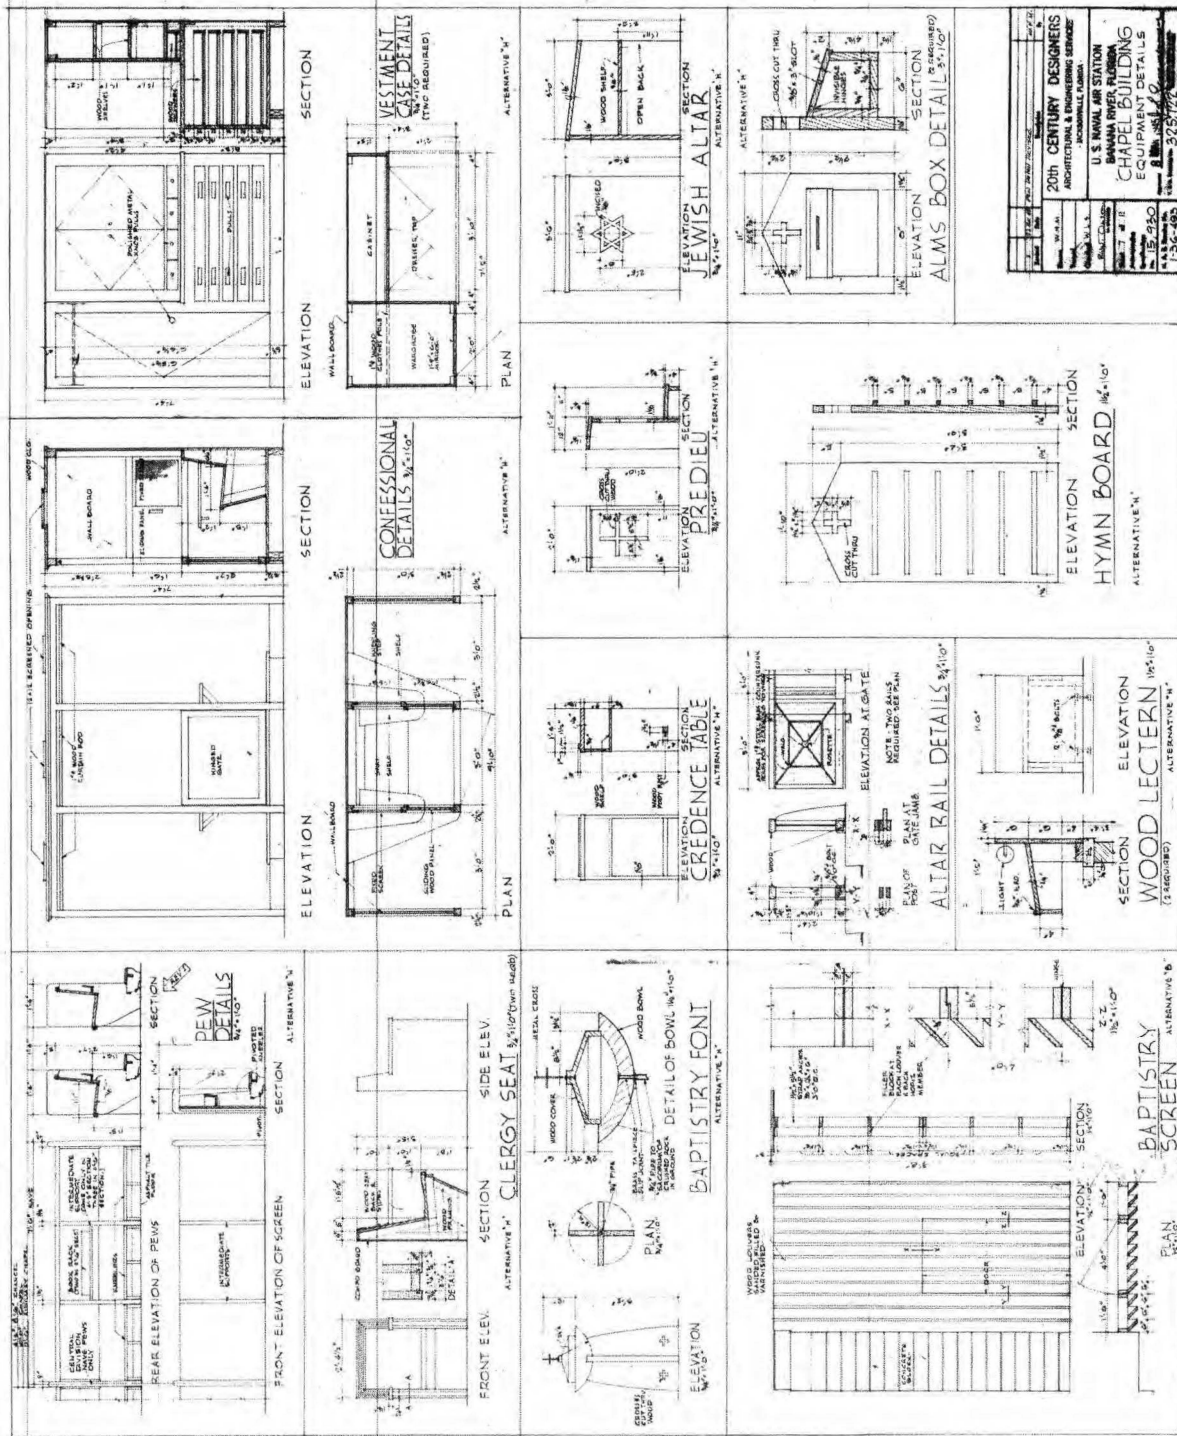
Equipment Details, Chapel Building, U.S. Naval Air Station Banana River, Florida, 8 March 1945.
